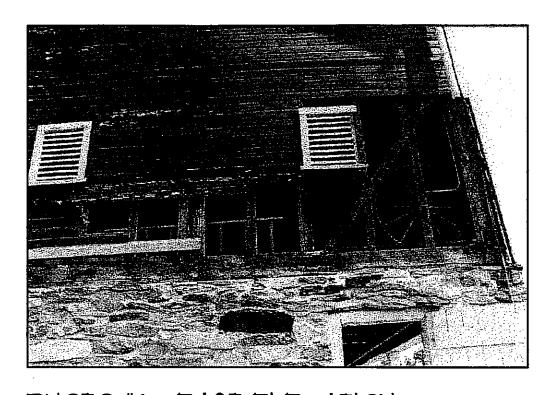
EAST ELEVATION ADDITIONAL SIDING REMOVED ALONG EAST ELEVATION TO EXHIBIT DETERIORATING CONDITIONS OF PERIMETER WALL STRUCTURE.
